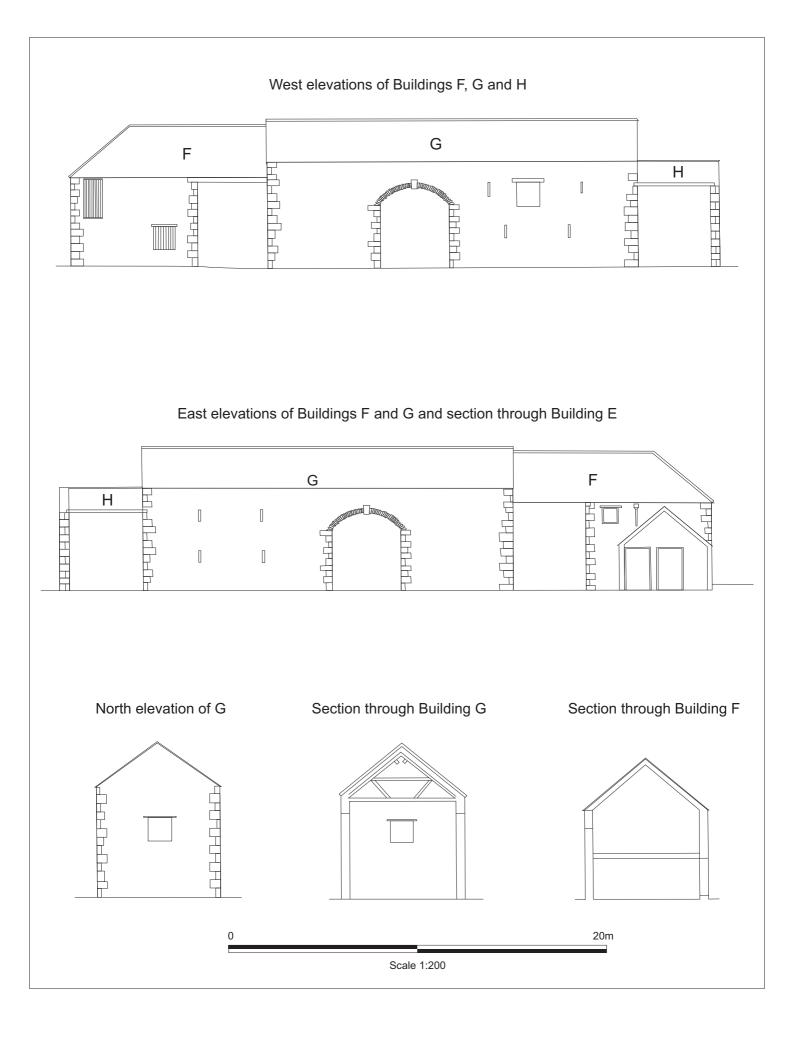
West, east and north elevations and sections through Buildings E, F, G and H at scale 1:200
